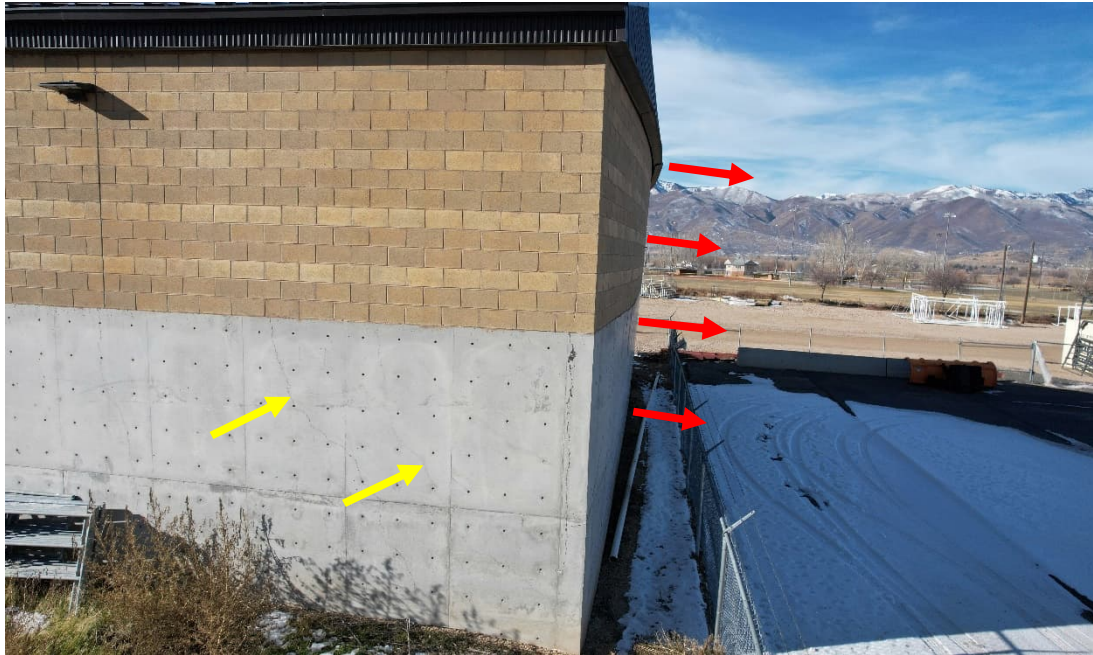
Outward bow of north wall; diagonal fractures in concrete at east wall.
